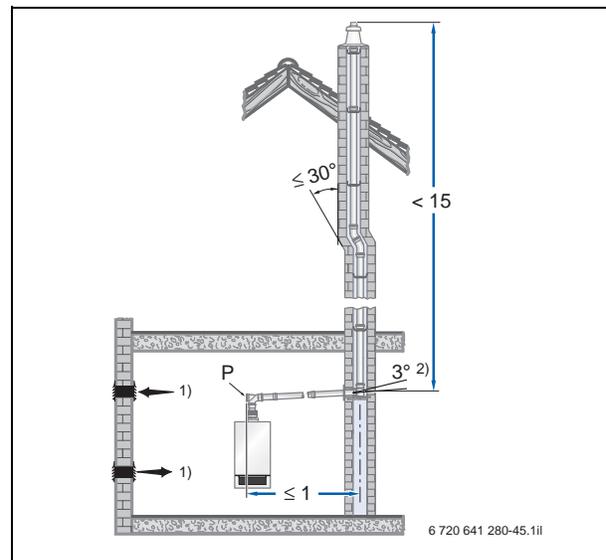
Example with the inspection aperture (P) located in a horizontal flue without diversions in the installation room (dim. in m)
